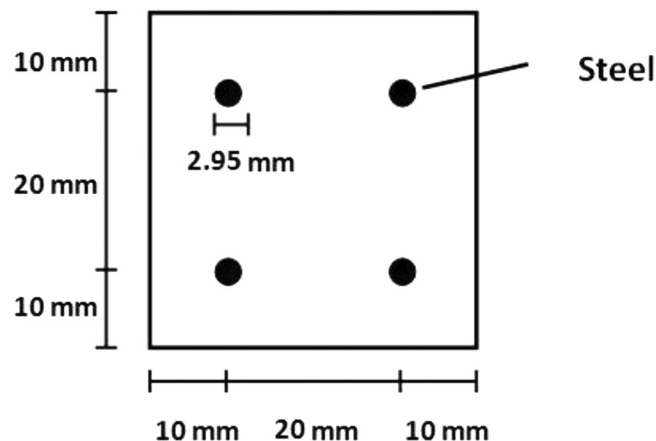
Schematic illustration of 40 x 40 mm (1.6 x 1.6 in.) cross section of specimen containing steel for flexural testing up to failure. Specimen is 160 x 40 x 40 mm (6.3 x 1.6 x 1.6 in.), perpendicular to plane of drawing. Steel is shown by black areas. (Note: 1 mm = 0.0394 in.)
